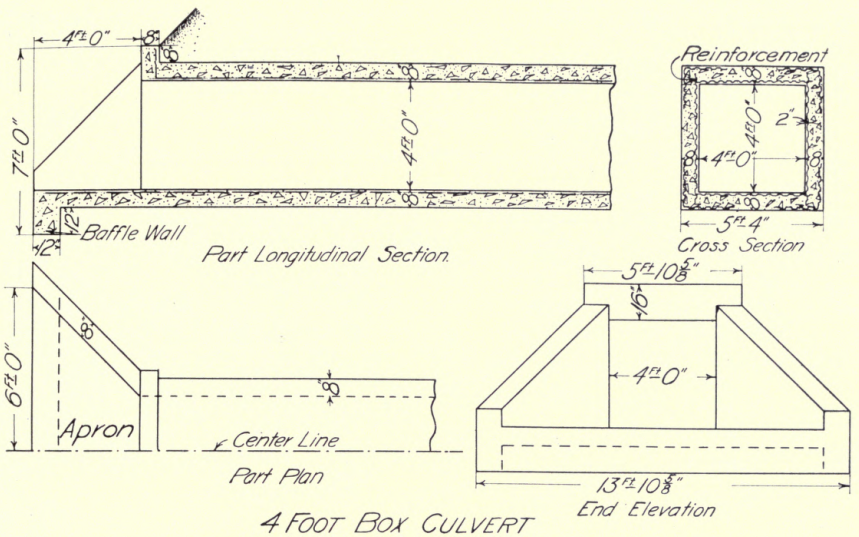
REINFORCED CONCRETE BOX CULVERTS.
